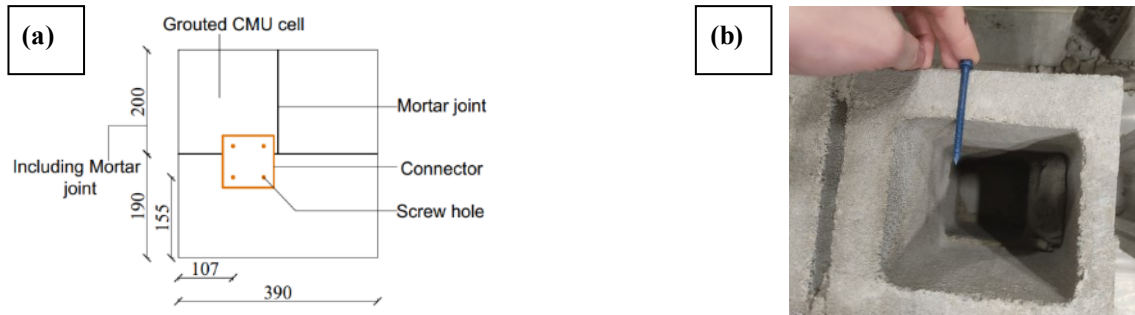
Embedded bar dimensions a) General dimensions. b) Bar sample.
